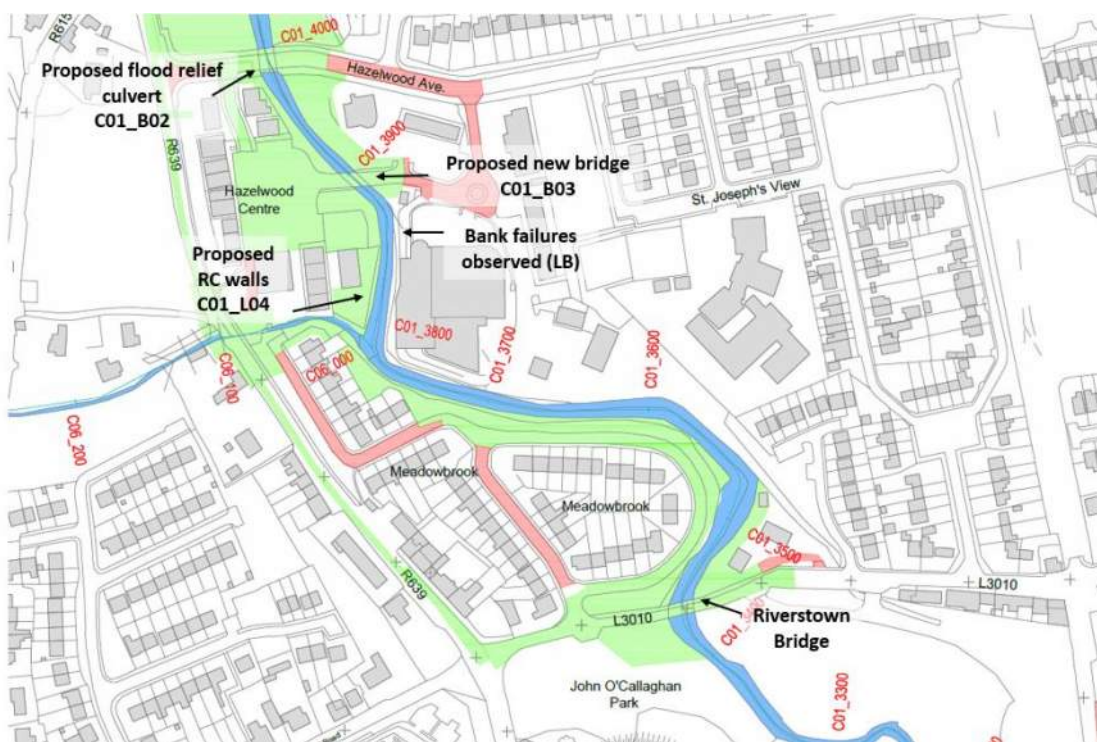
Proposed RC flood wall on right bank, no works proposed on left bank (clipped from drawing ref. GR-502, where green = indicative extent of works)
